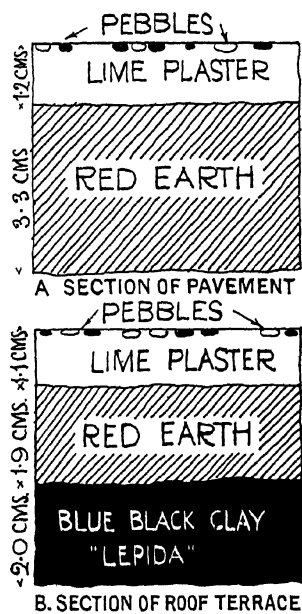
TWO SECTIONS. SECTION A OF CEMENT ('TARAZZA') FLOOR OF LIGHT-AREA, S.E. ANGLE. SECTION B OF ROOF TERRACE.
